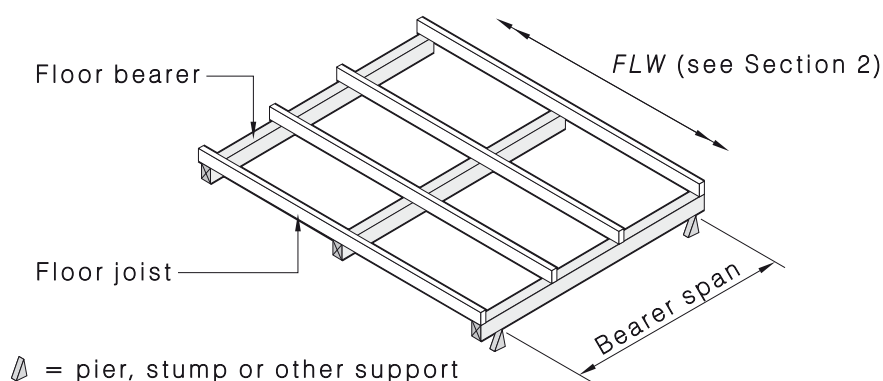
BEARERS SUPPORTING FLOOR LOADS ONLY
